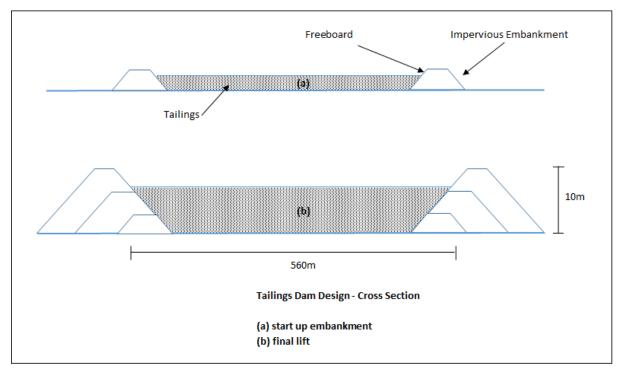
Cross Section of Paddock Tailings Storage Facility
